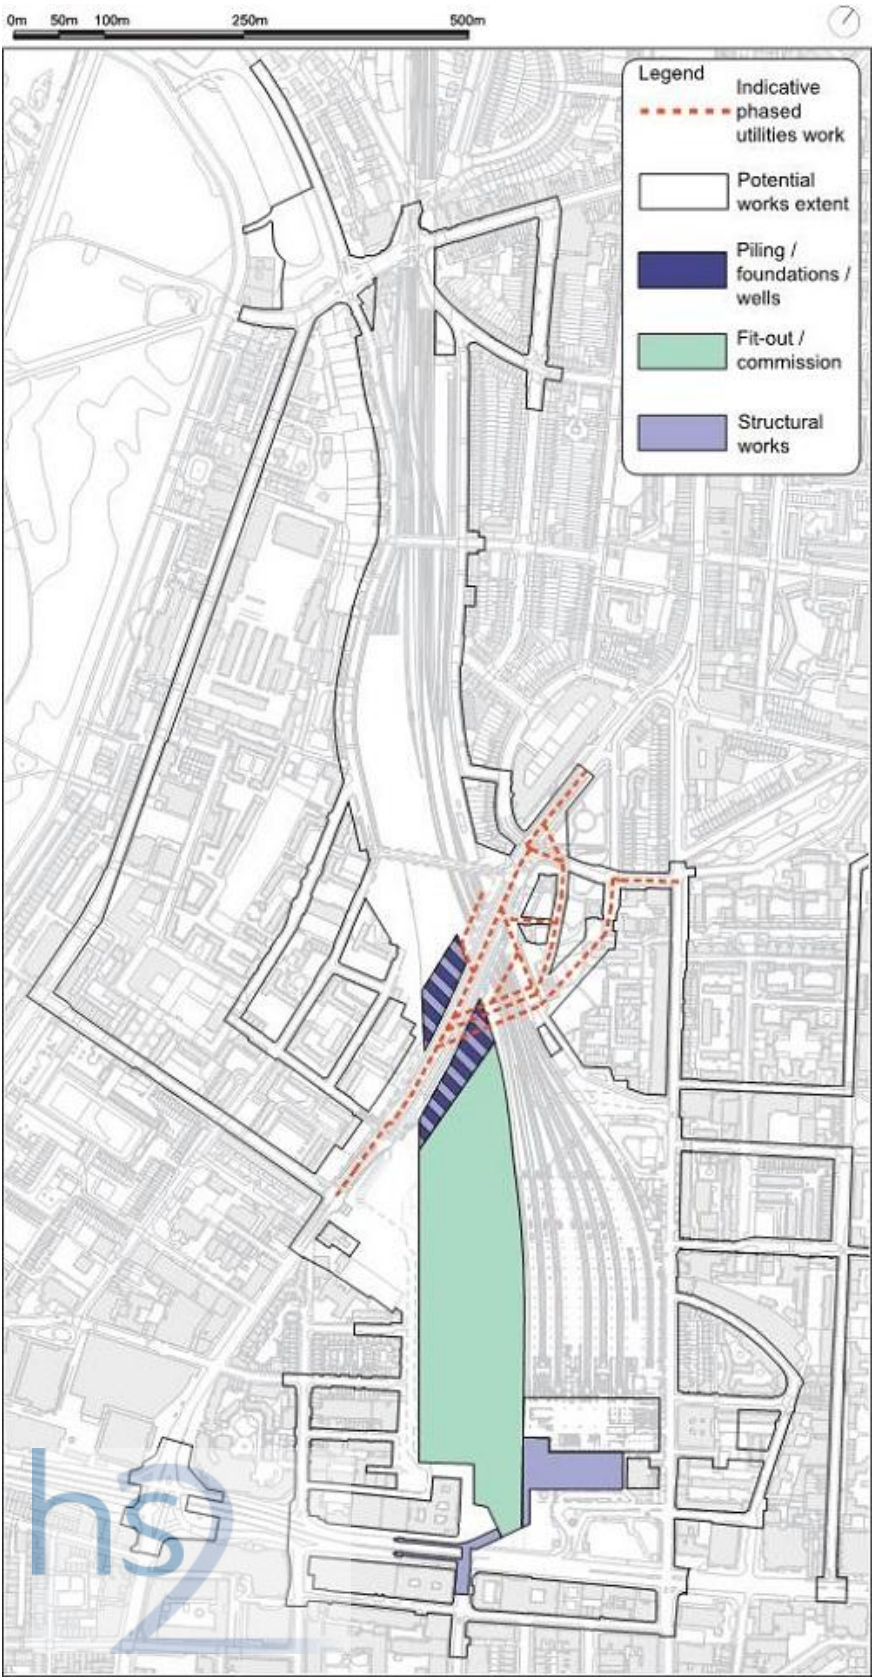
2022 utility, excavation, structural and fit-out works
